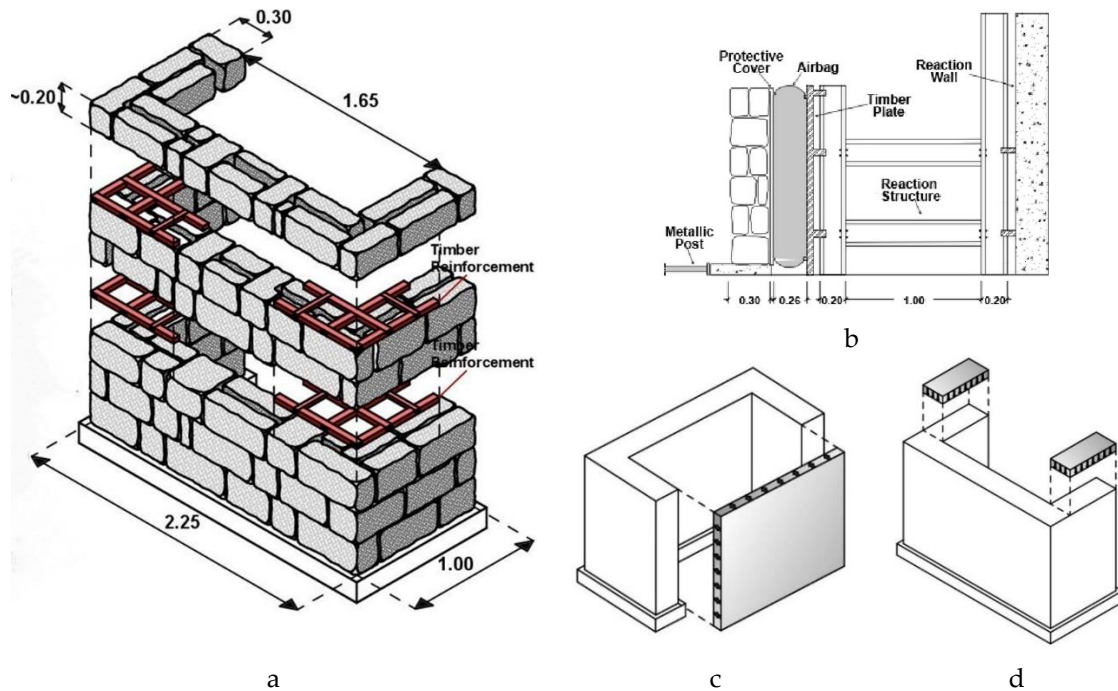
Experiment details (a) Timber-reinforced masonry details, (b) Test set-up, (c) Vertical load configuration, (d) Horizontal load configuration from [96]
